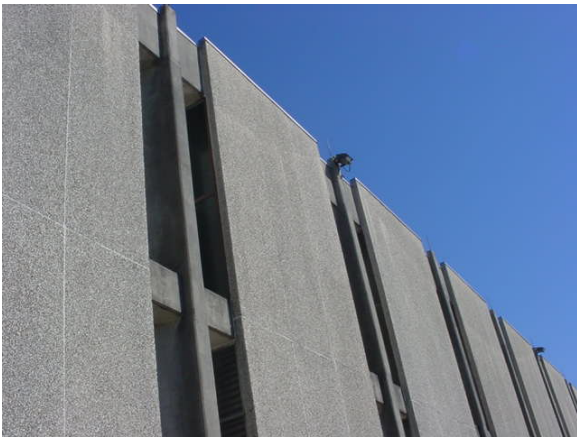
Damaged lighting on rear side of building similar to front side lighting
